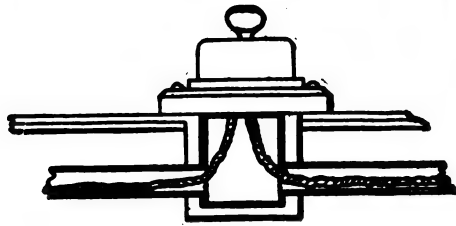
FLEXIBLE-TUBING JUNCTION BOX.
